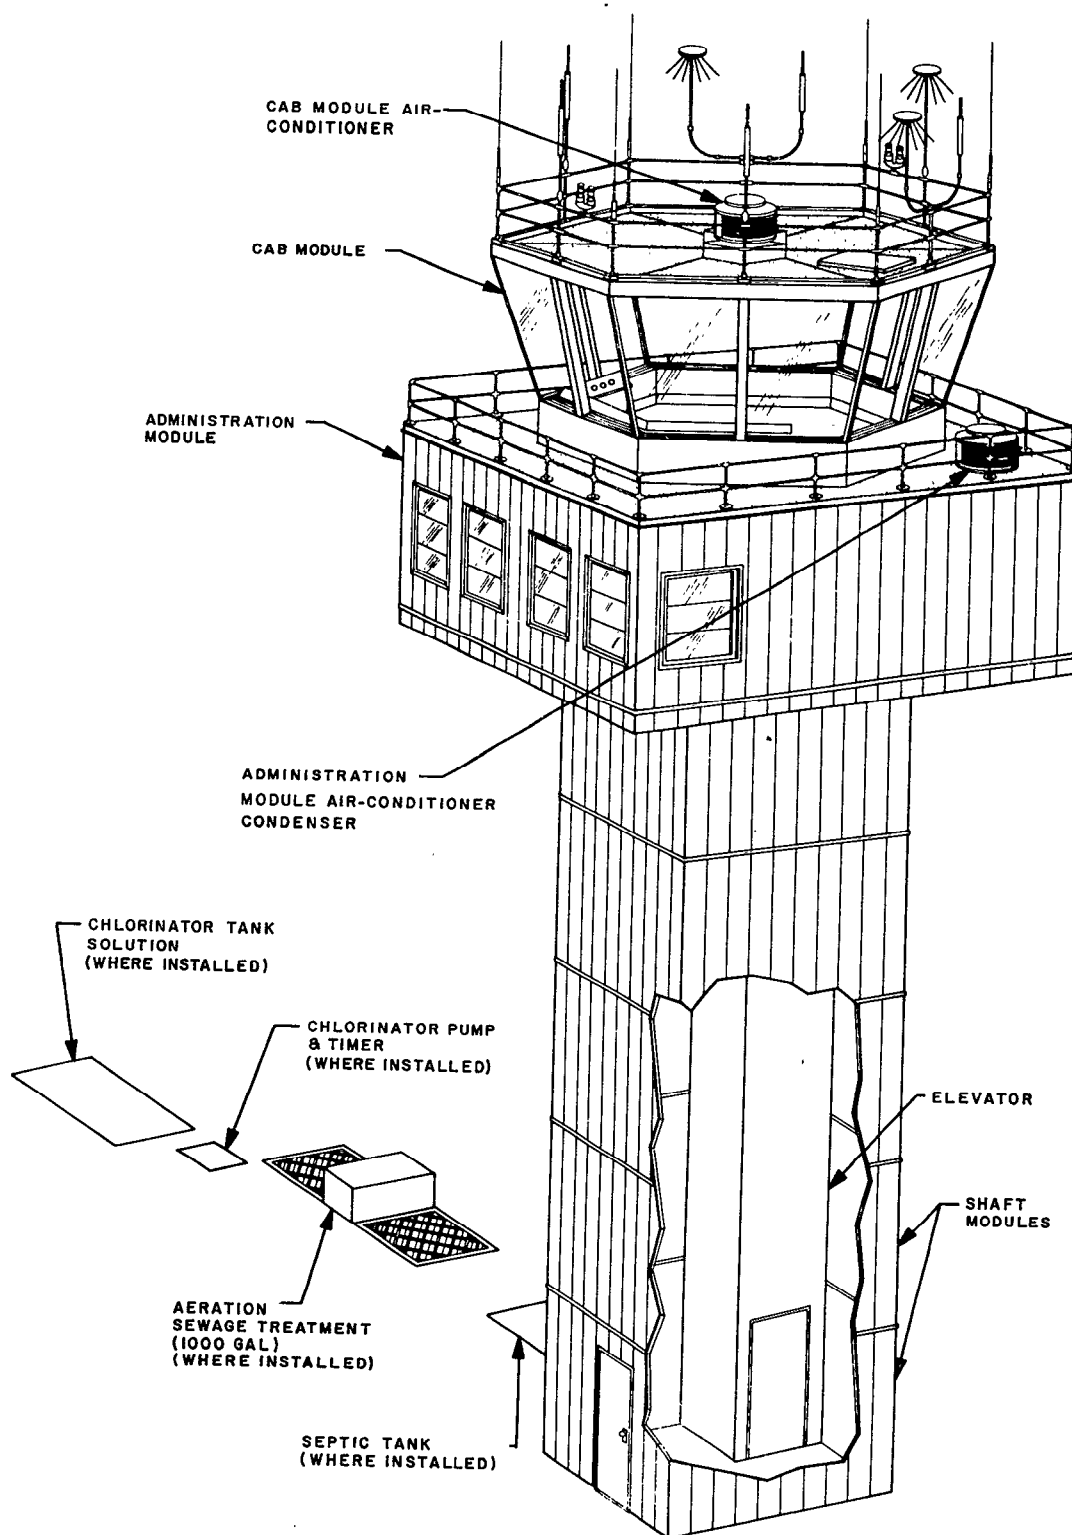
Typical AW-6 Airport Traffic Control Tower
